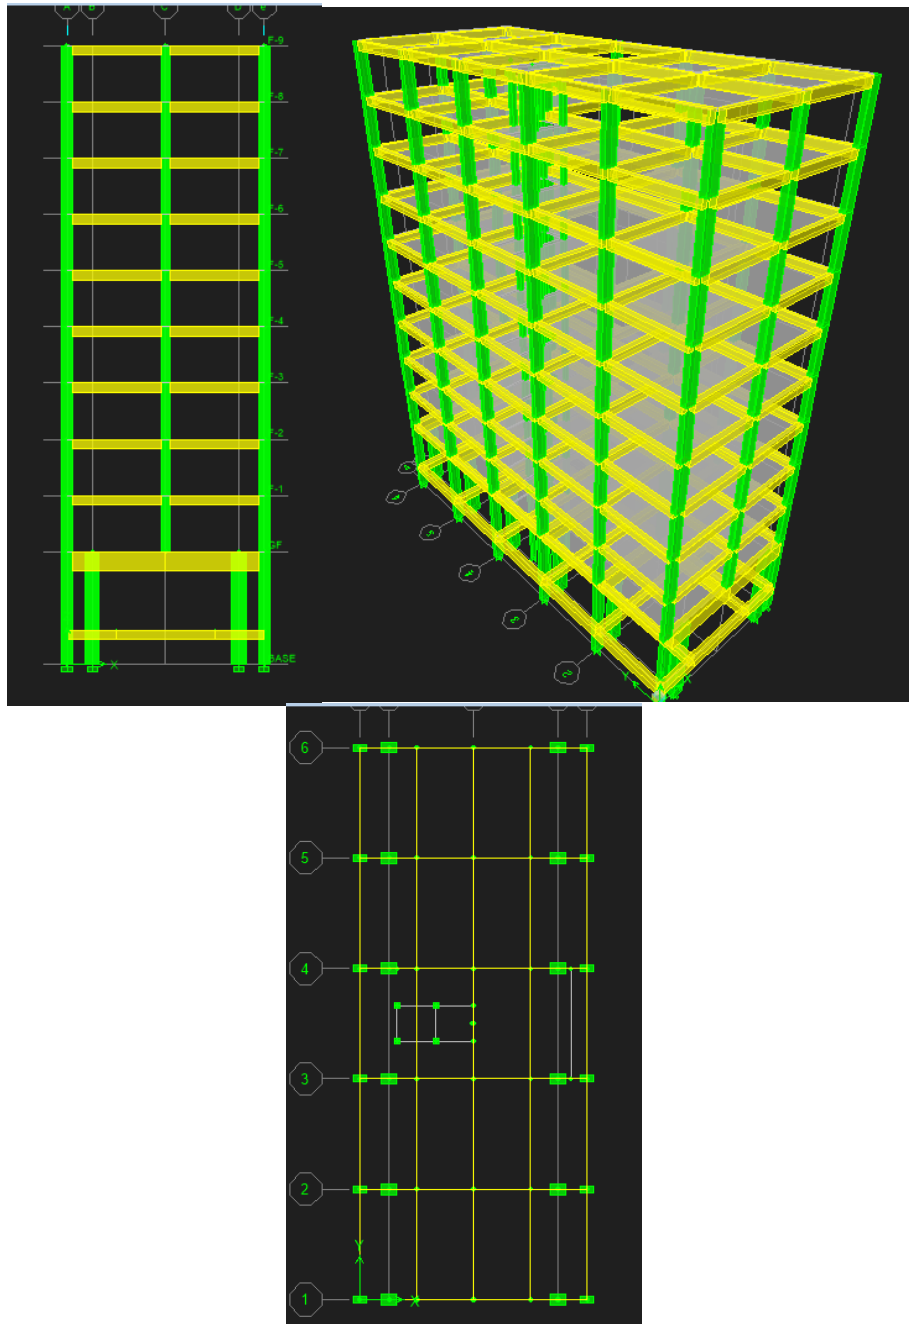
Elevation view, 3D view and ground floor plan view of case 5
